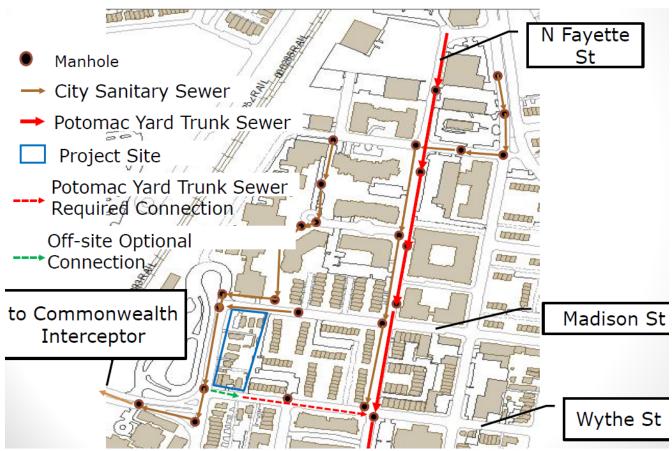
Staff recommended proposed condition with connection to PYTS and optional off-site connection.
